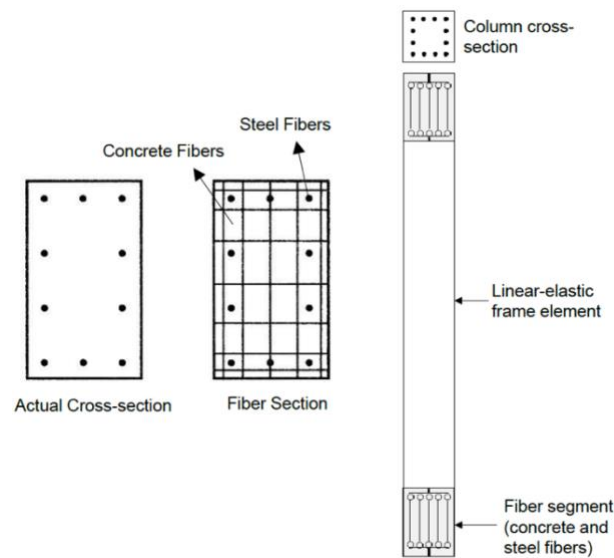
Fiber section of a reinforced concrete column ((Powell, 2010, Mazhar H. et al., 2021)
